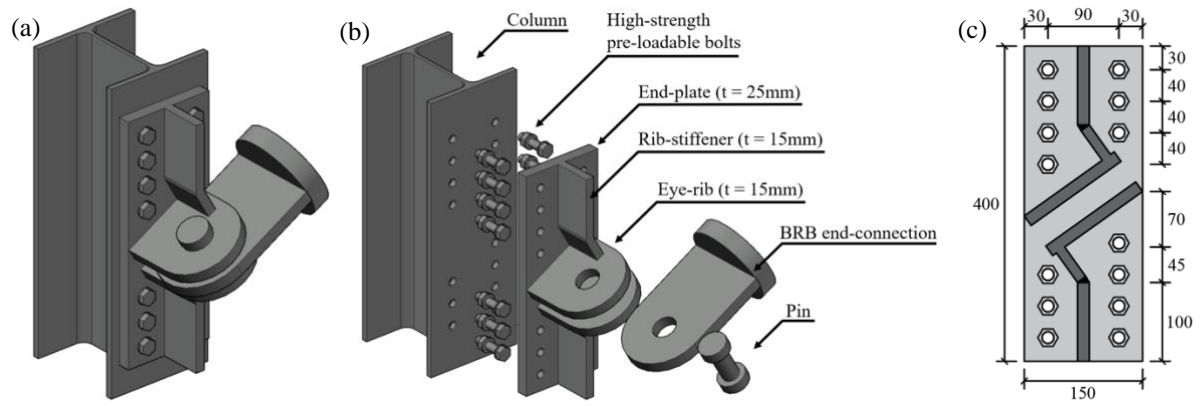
BRB-to-column connection details: (a) geometrical configuration; (b) disassembled configuration; (c) geometric dimension [units in mm].
